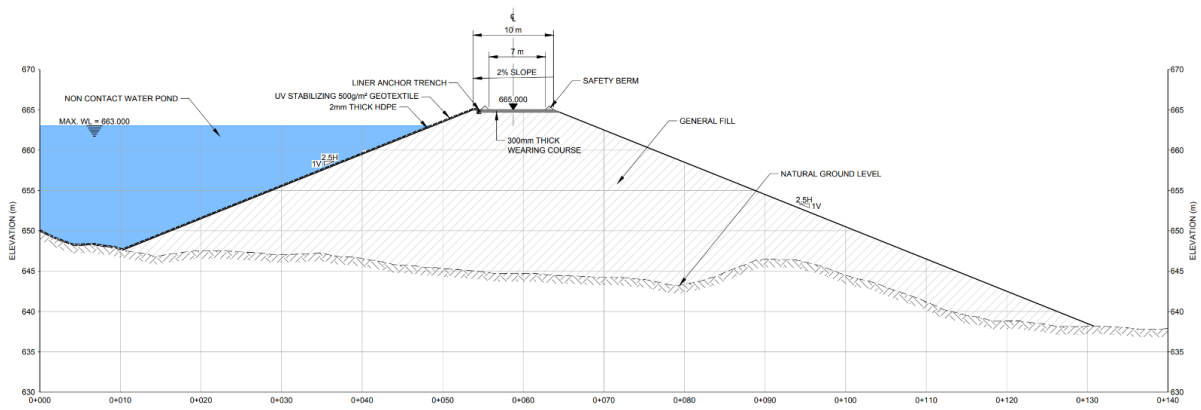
presents the plan view of the Non-Contact Water Pond while Figure 18.25 presents a cross-section.
